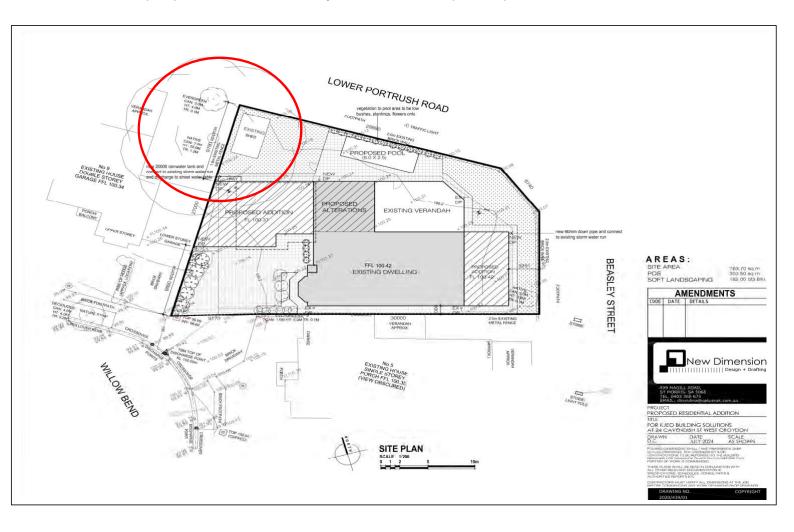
show the plans for proposed addition to the existing dwelling located at 7 Willow Bend, Marden SA 5070.
